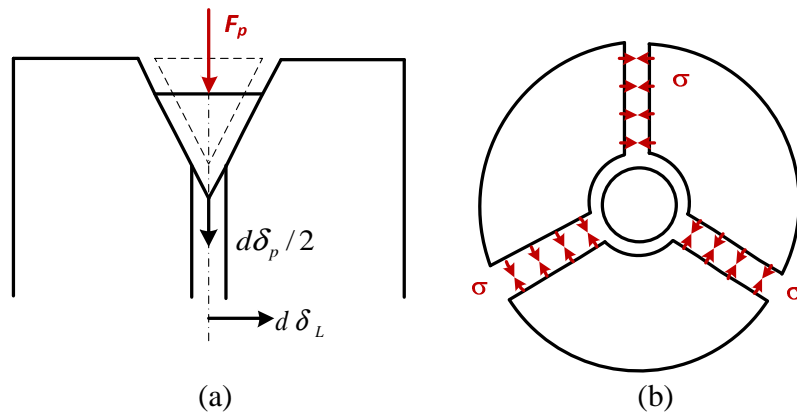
(a) Front view of specimen after cracking (b) Top view of specimen after cracking (Blanco et. al 2014)
